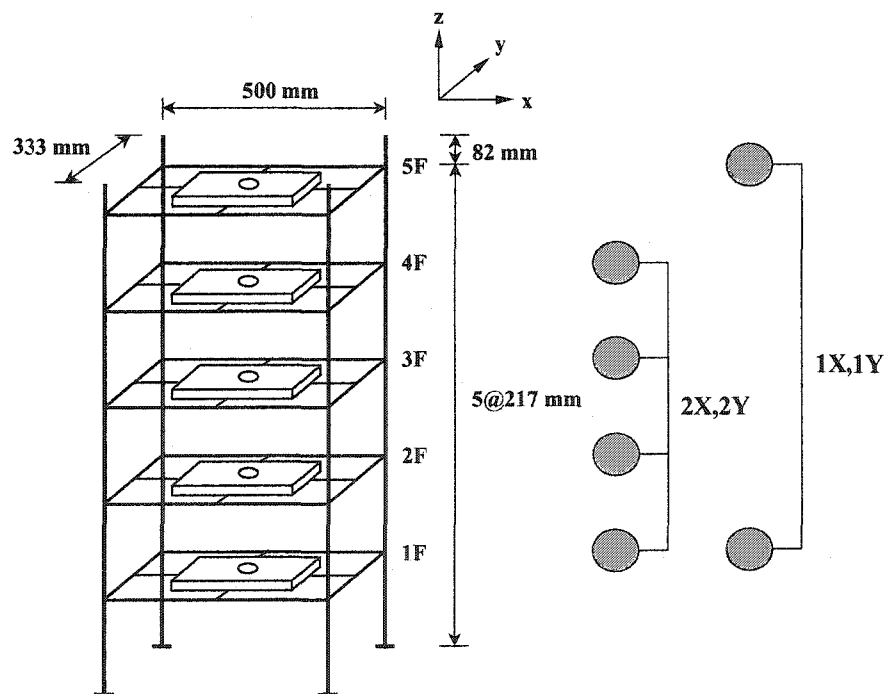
Sketch of a Five-Story Aeroelastic Building Model and Measurement Setup,
